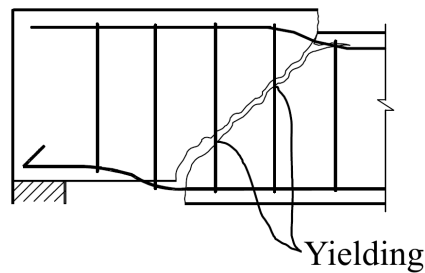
Shear sliding failure of RC beam with shear reinforcement (Al-Emrani et al., 2013).
